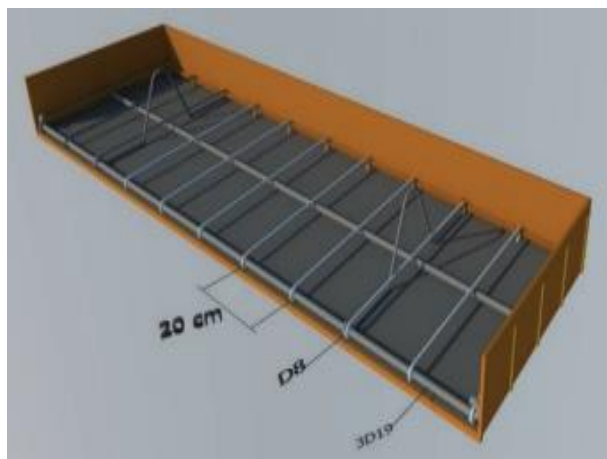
Dimensions and specimens of reinforced concrete slabs
